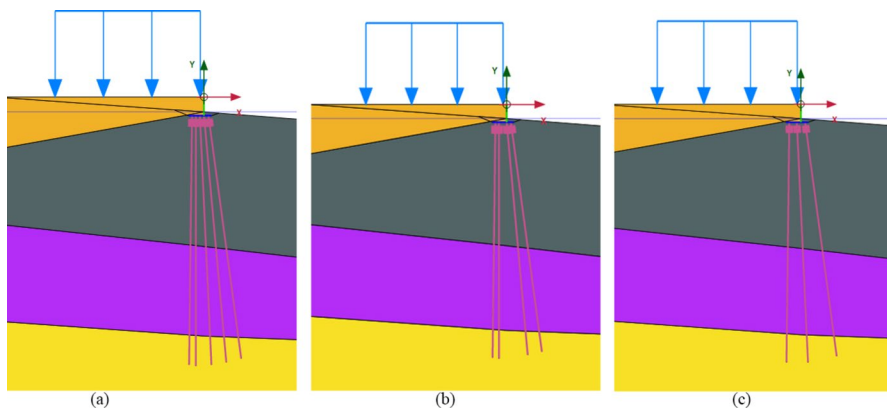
Structure of the foundation system of the soil retaining wall with 5 piles (a), 4 piles (b), and 3 piles (c)
